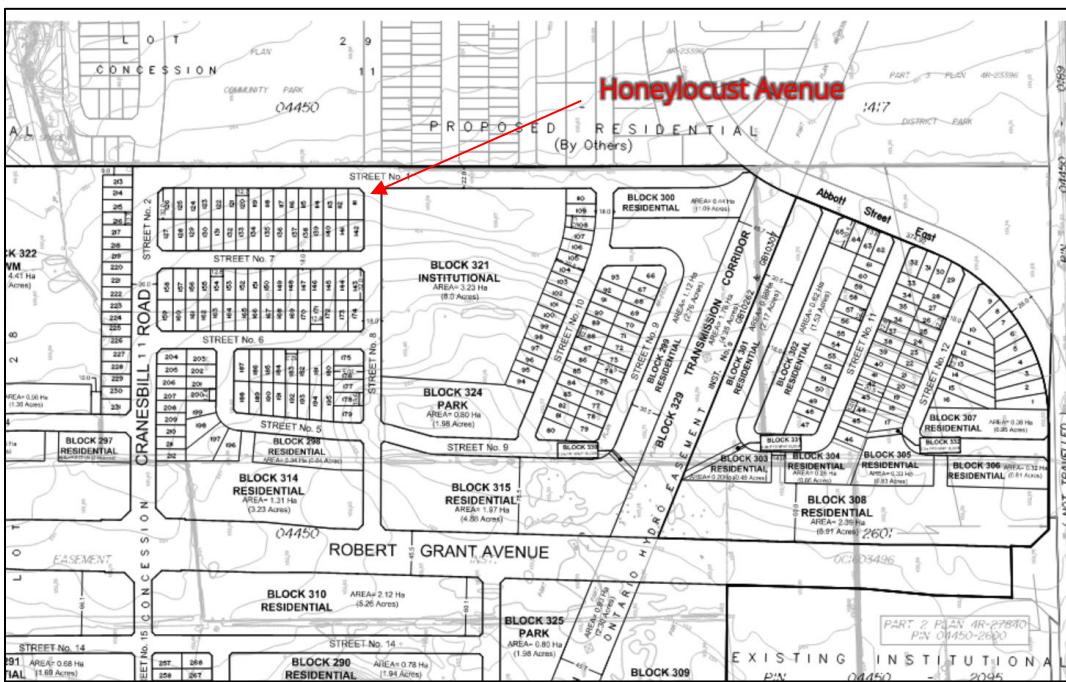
5618 Hazeldean Road Draft Plan of Subdivision
